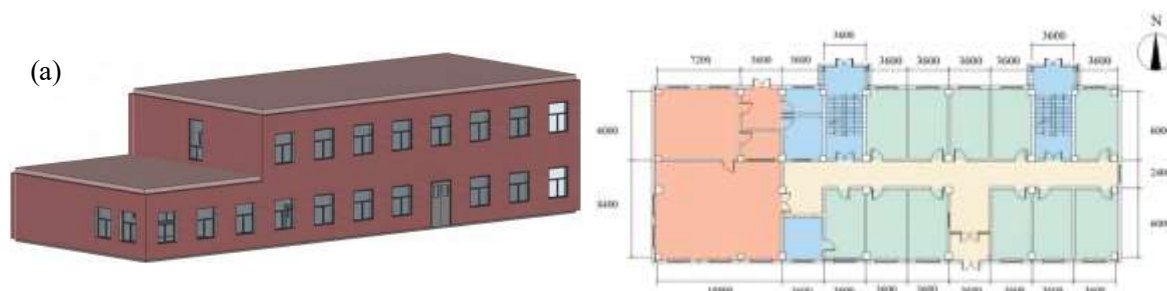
Rchitectural model of the railway building. (a) Architectural 3D Model (b) First Floor Plan.
